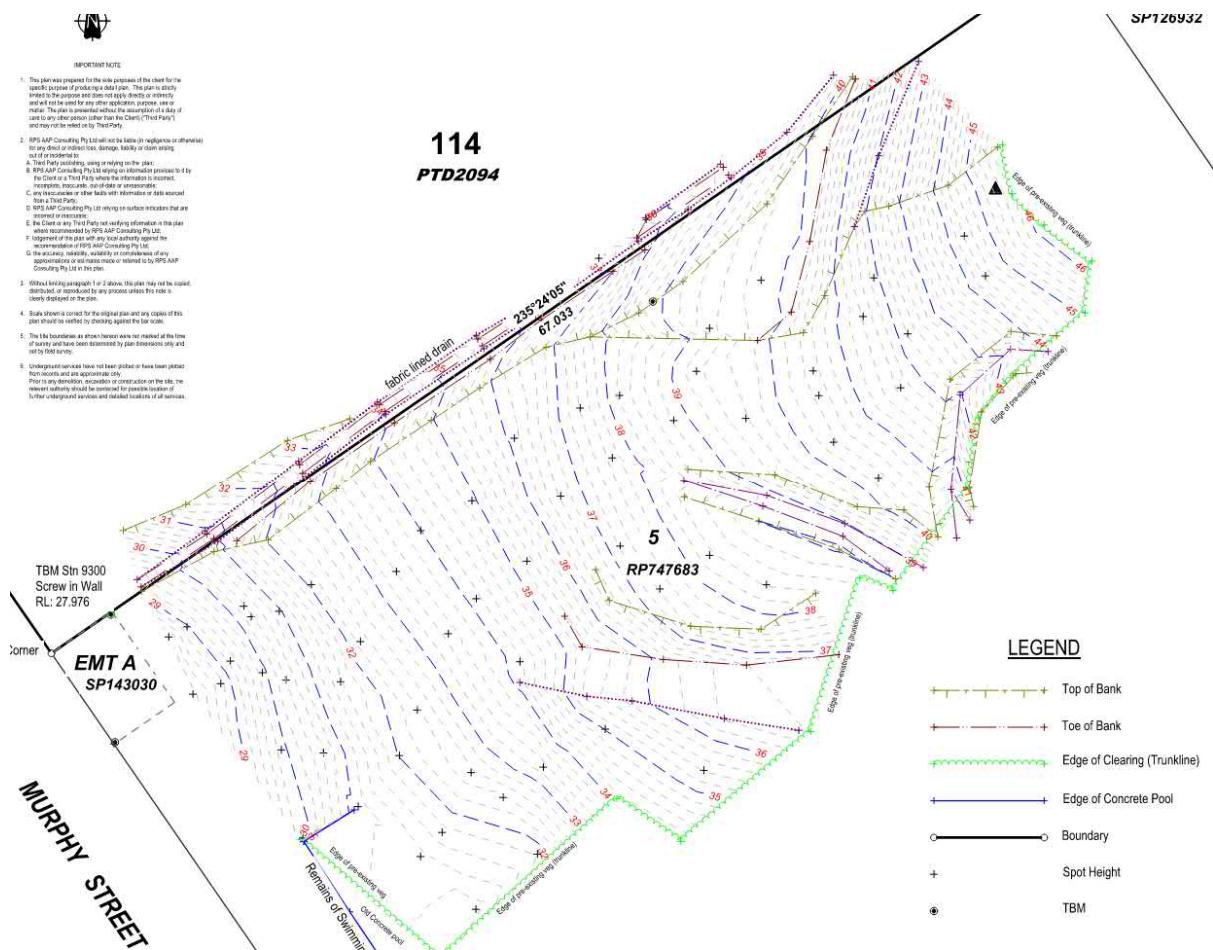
Site Location (Source: RPS Drawing PTD17397-107)
